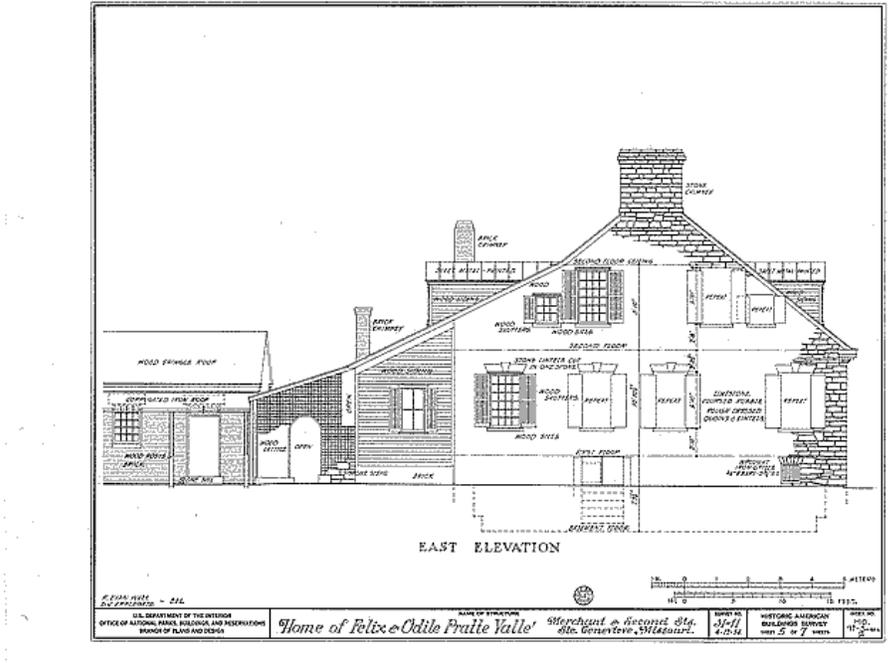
The Historic American Building Survey drawing of the Felix Valle (no relation) house in St. Genevieve, Missouri with many of the design elements of French vernacular, which was used by Maxwell and Valle in New Mexico.
